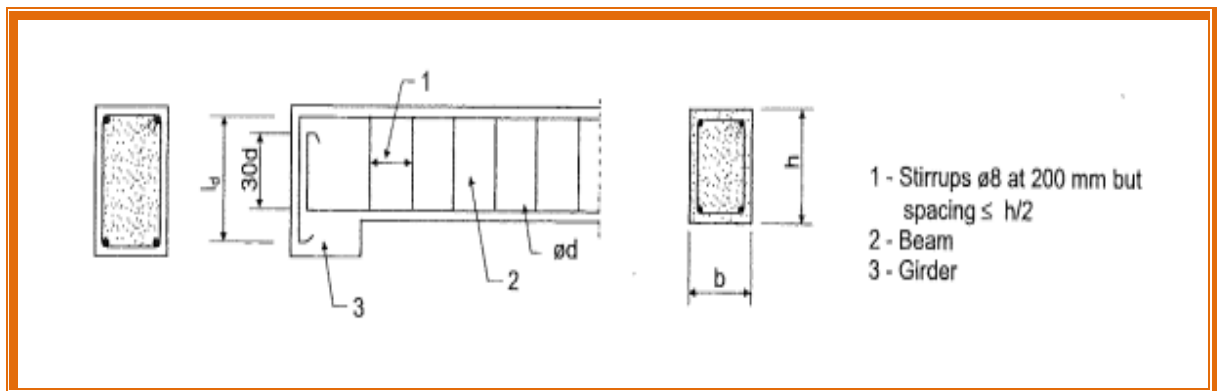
Connection between beam and girder (Kaikan K. (2001)).
